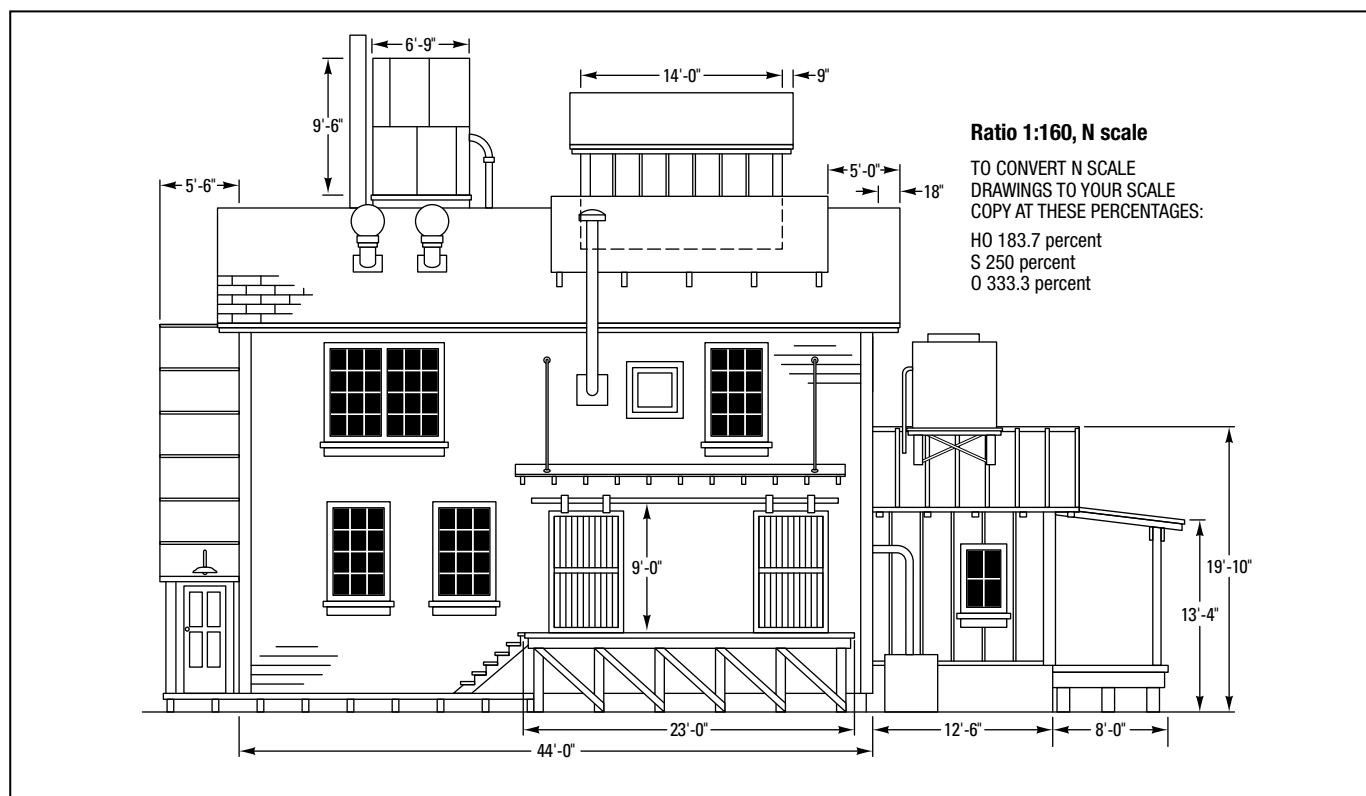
From rough to refined. Once Brooks was satisfied with his conceptual sketch, he made drawings with door and window placement, detail locations, and dimensions. The back of the building has no doors or windows.
